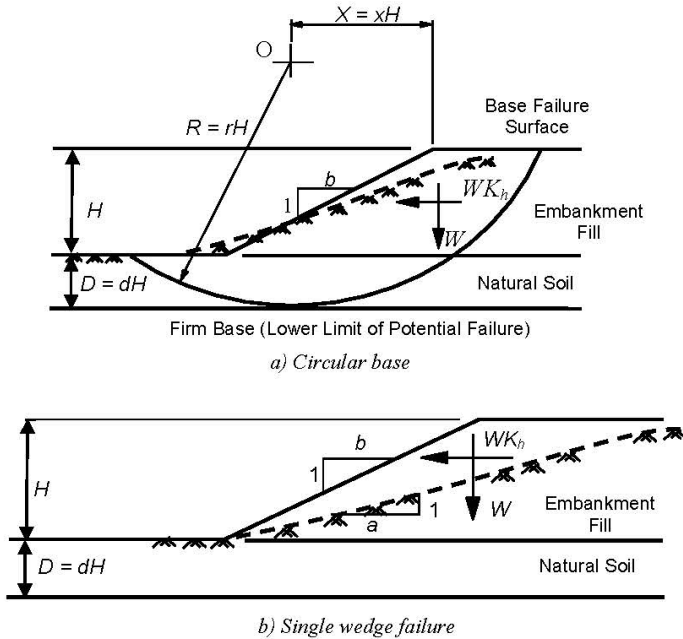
Failure types of bridge embankments (a) circular base failure and (b) single wedge failure
